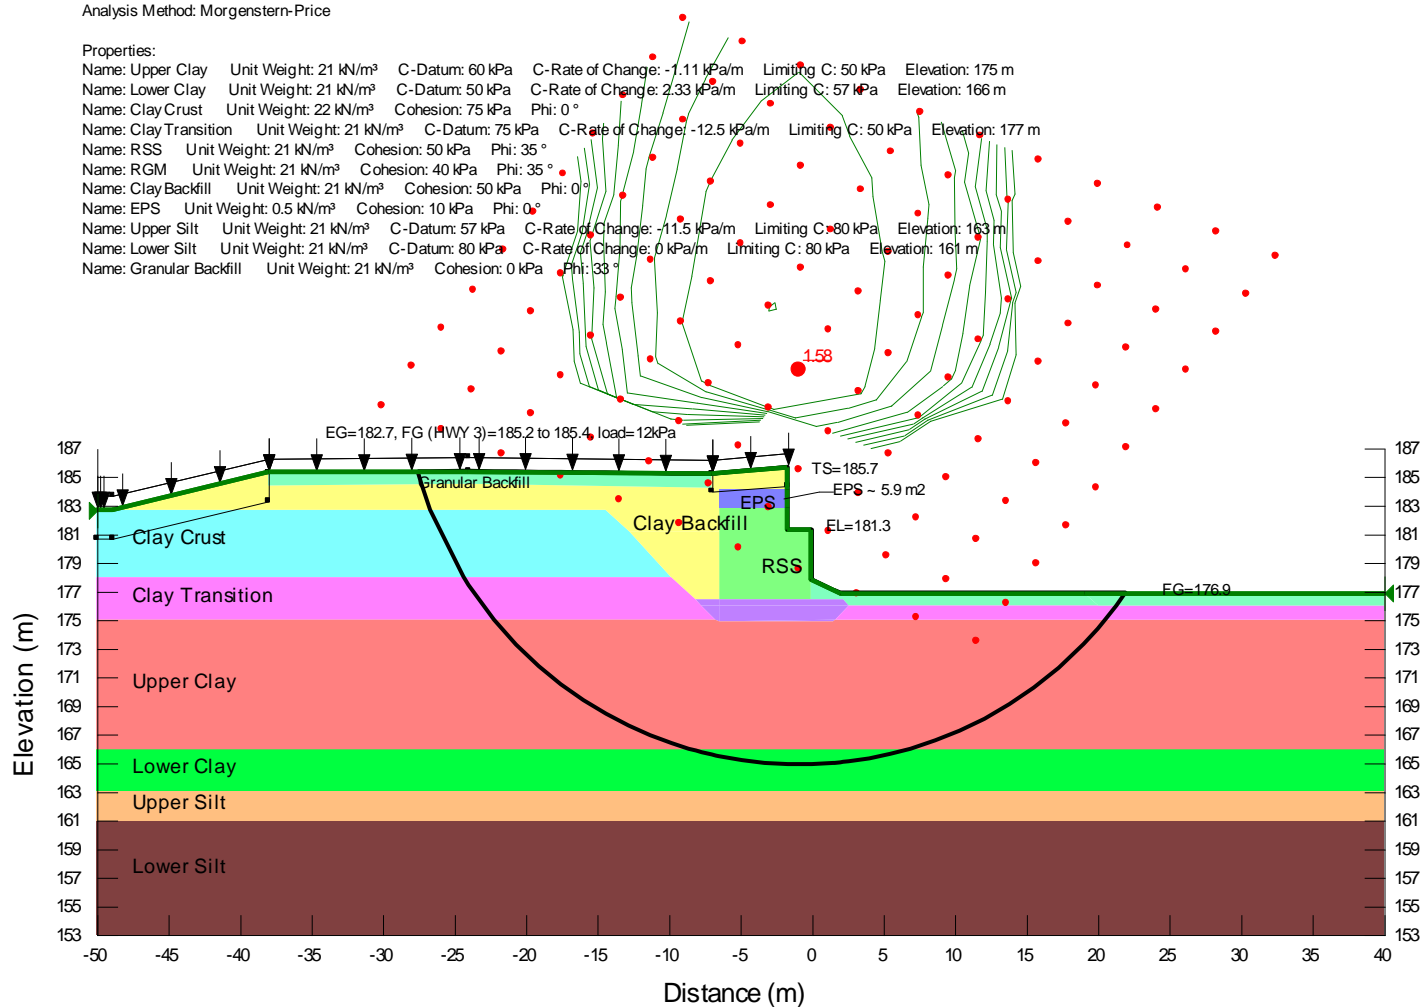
Global Stability Result – South Abutment (East Segment) – Long Term (Drained) Loading
